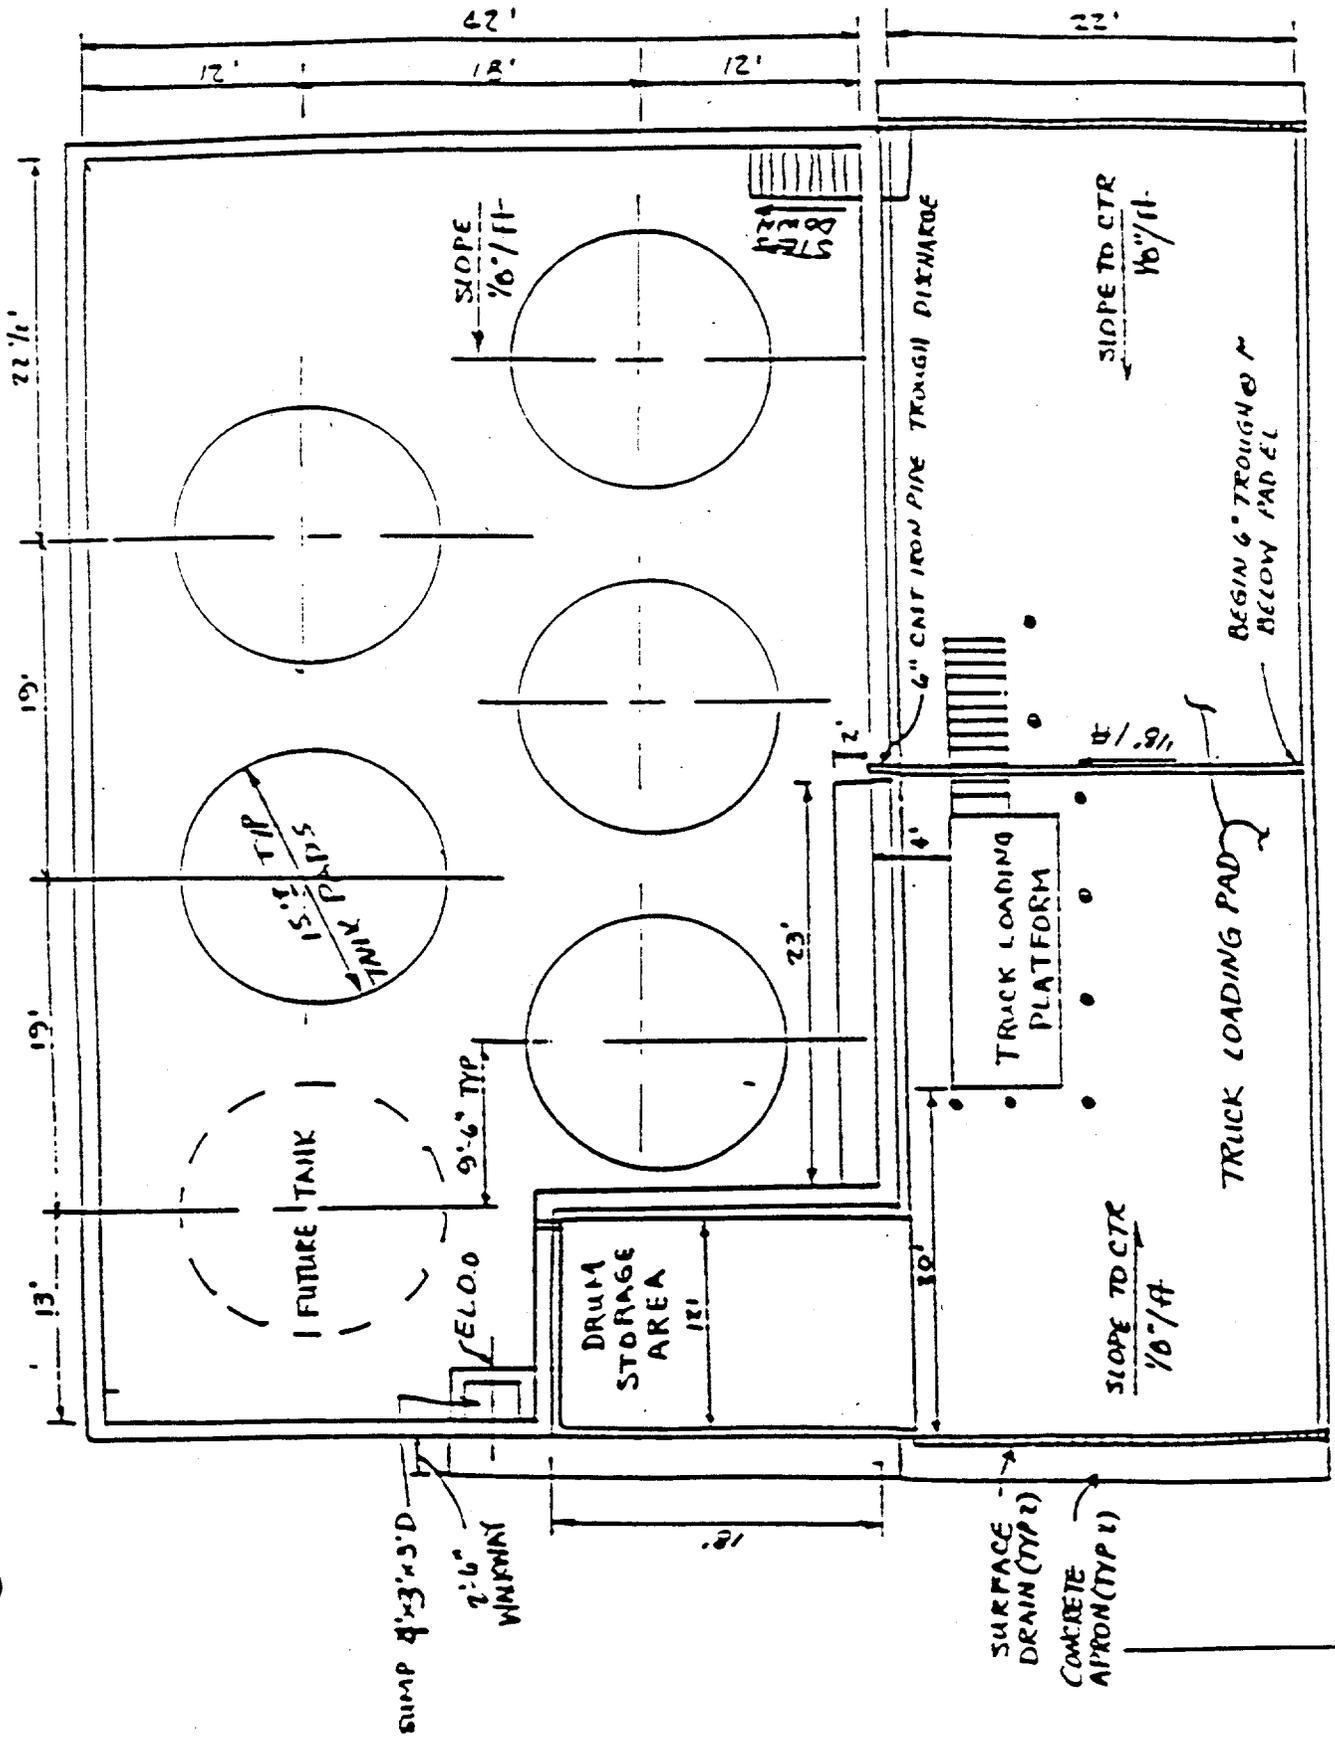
WASTE OIL/SOLVENT STORAGE FACILITY (5-019) PLAN
